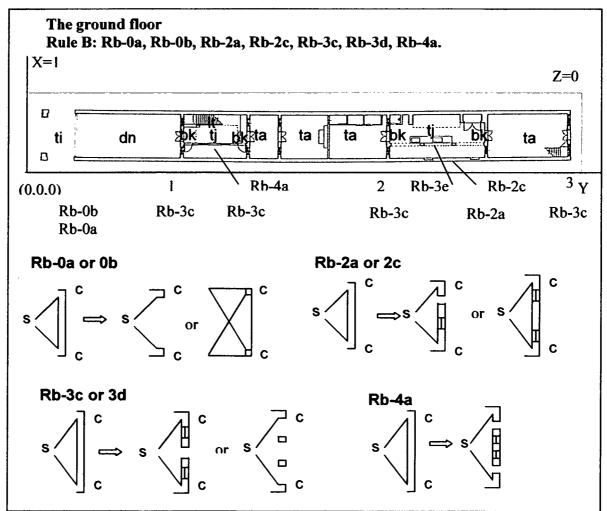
11 Rule B for the ground floor at Dihwa Street No. 71
